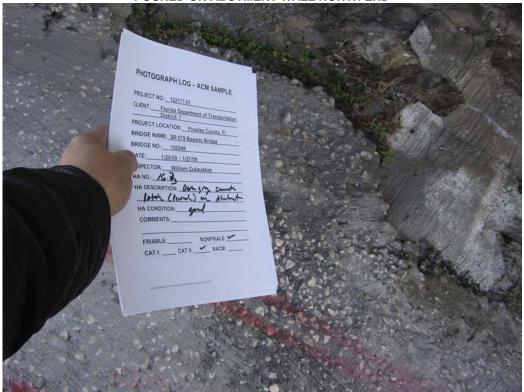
01/21/09 – SAMPLE 16.3 – HA 16 DARK GRAY CONCRETE POURED ON ABUTMENT WALL NORTH END
